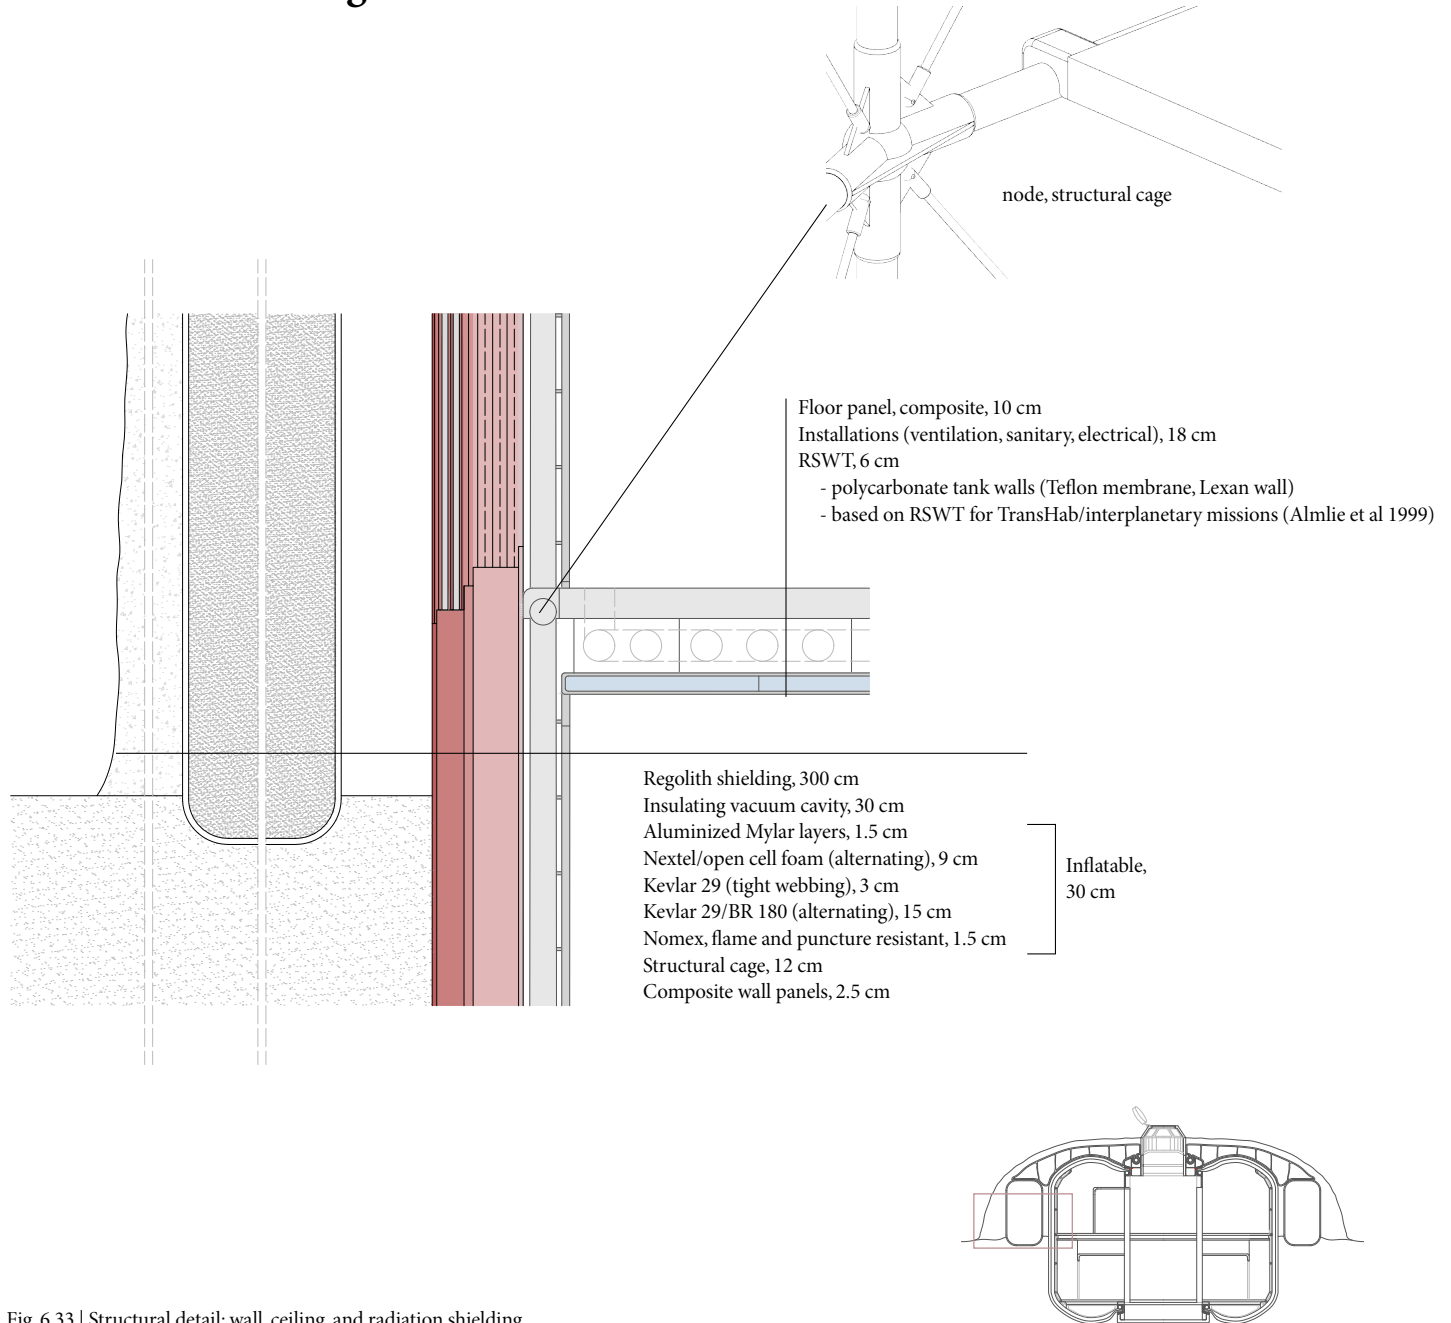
| Structural detail: wall, ceiling, and radiation shielding
